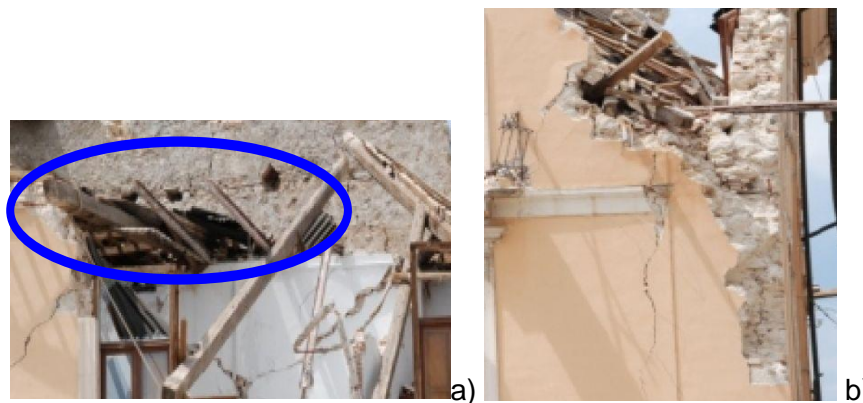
Structural details of the building 10.2. a) Orthogonal purlins to the façade 10.2e, b) good construction materials observed from cracked corner of the building 10.2
